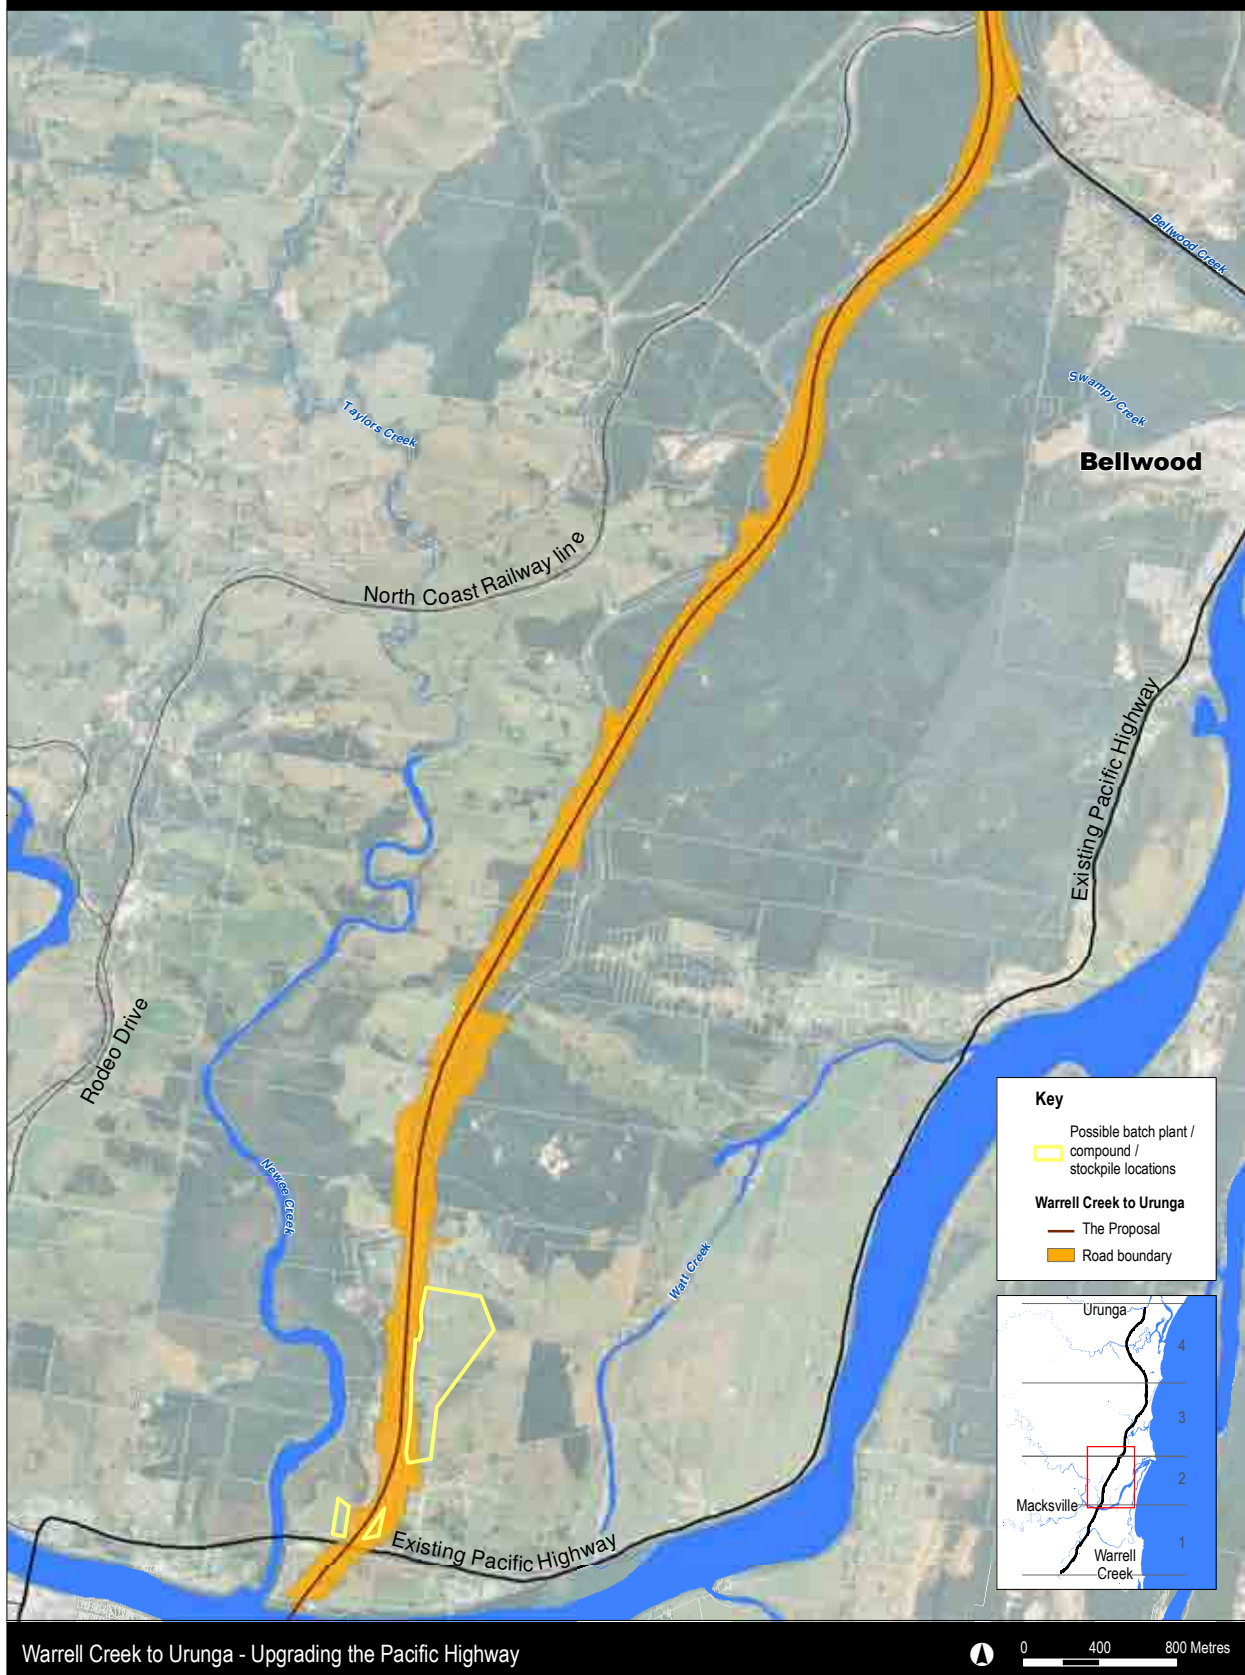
| LOCATION OF POSSIBLE CONSTRUCTION COMPOUNDS, BATCH PLANTS AND / OR STOCKPILE SITES SECTION 3 OF 4
